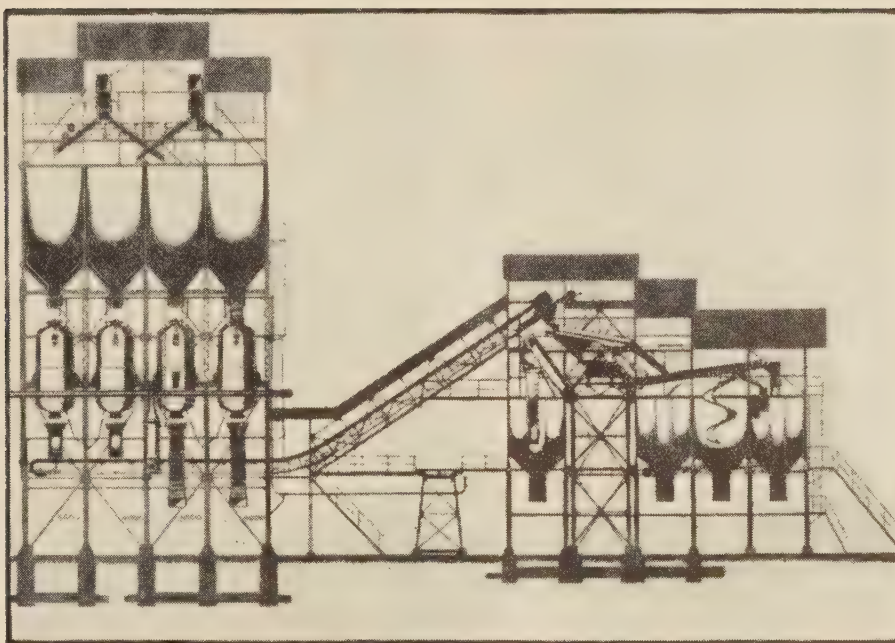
LONGITUDINAL SECTION, KOEFLACH PLANT
